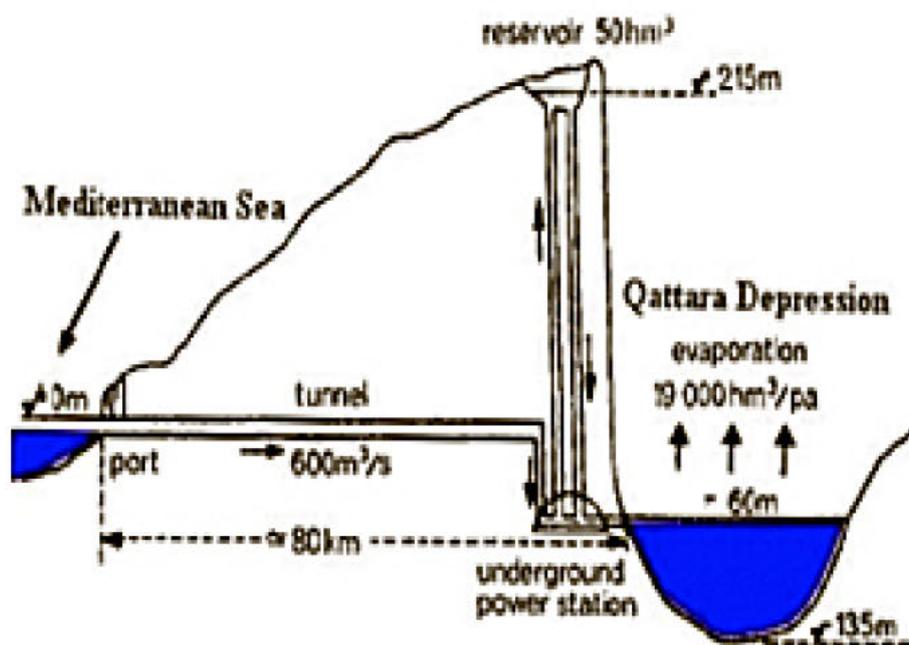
Previously suggested design with a tunnel and pipes for pumped storage [3].
